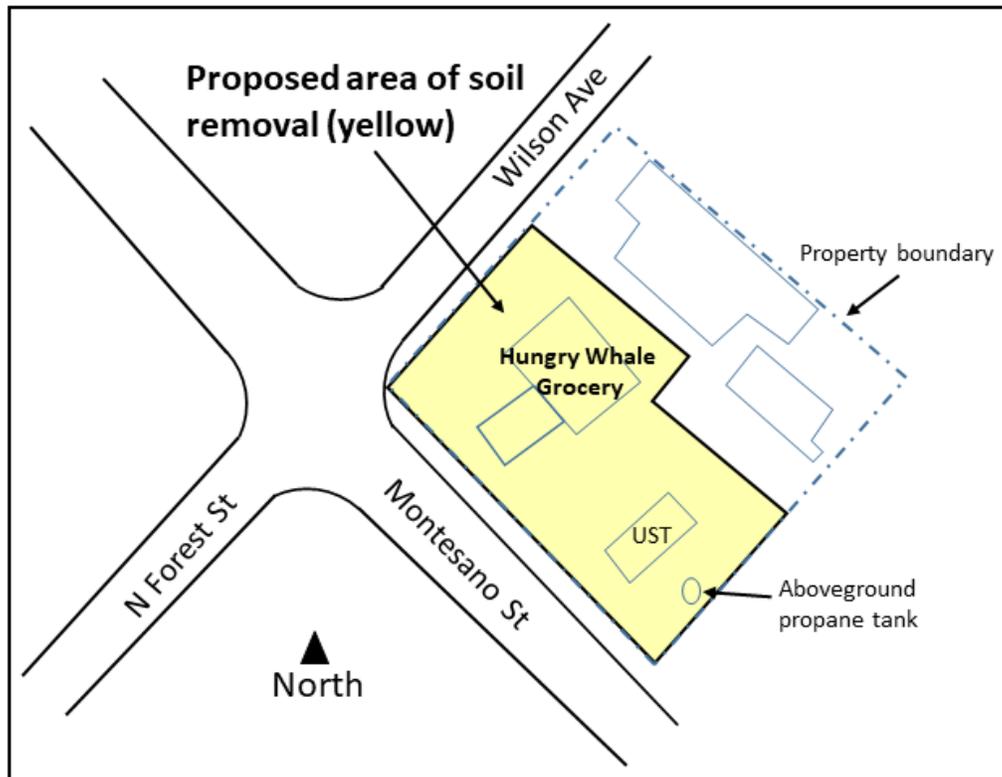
The yellow area shows where contaminated soil, buildings, and structures will be removed. Areas are not exact.
